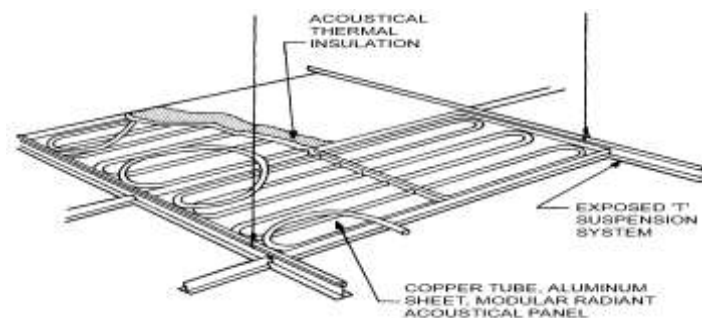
Metal ceiling panel bonded to copper tubing [3]
